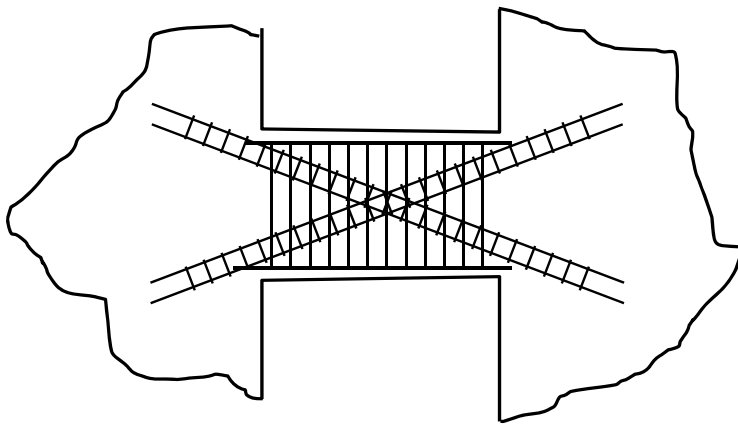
Ductile detailing for reinforcement of shear-controlled coupling beams.
